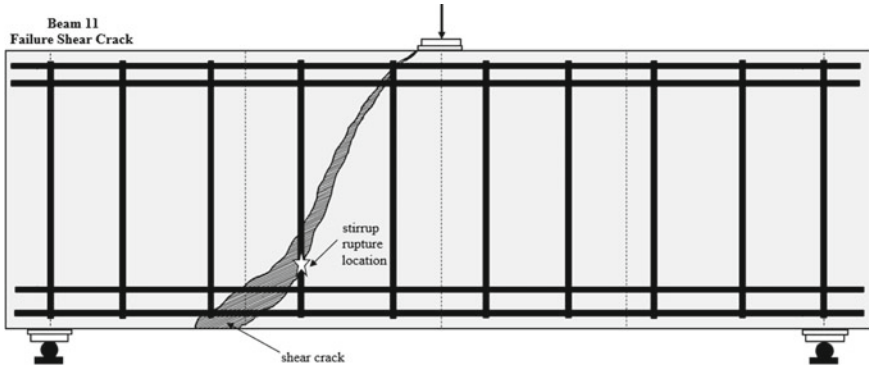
Failure crack of beam 1 (east side of the beam failed which was instrumented)
